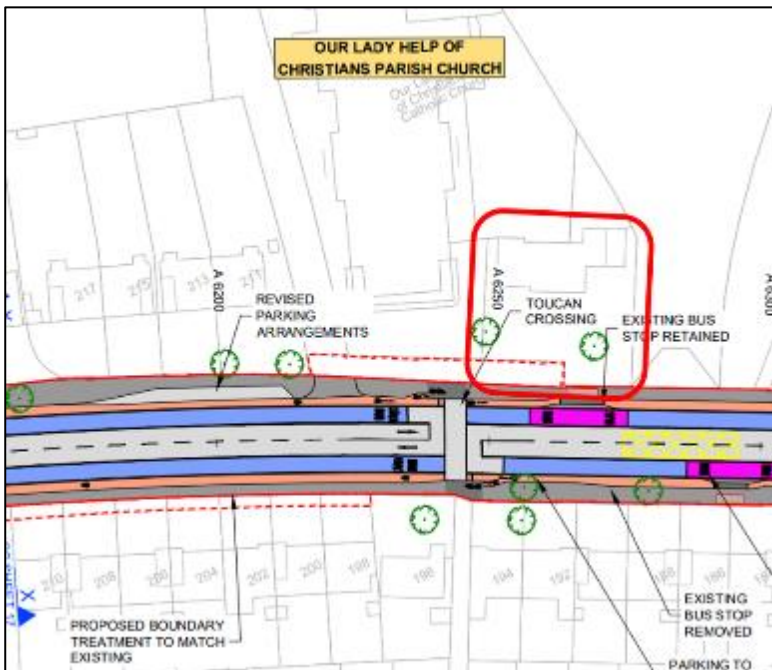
Proposed new Layout at 199 Navan Road
